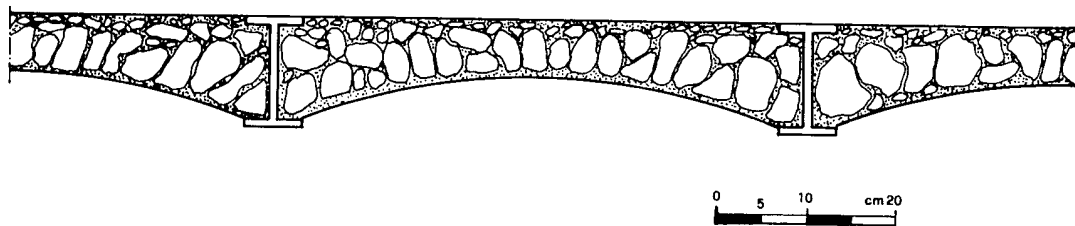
Floor with steel beams and vaults in pumice-stone and plaster (Randazzo, 1988).
